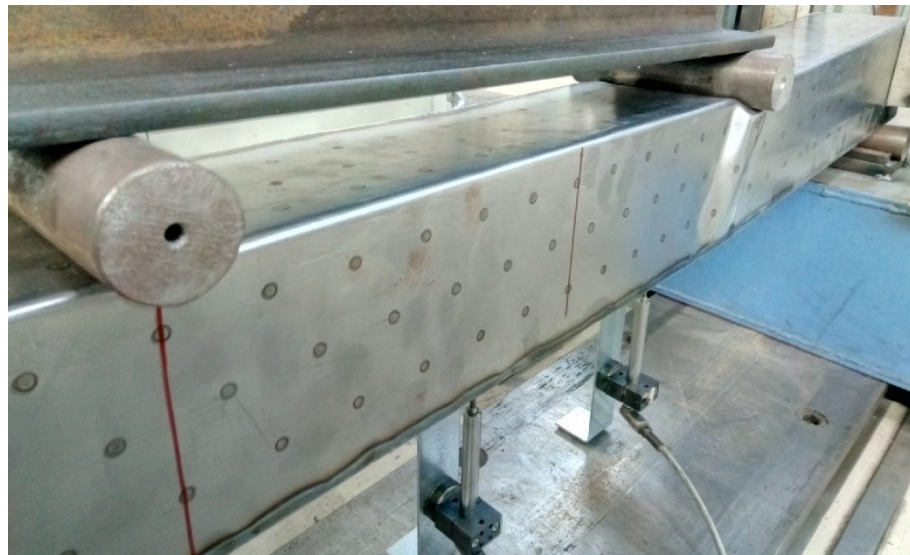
Beam 5 side view (flat 0.75 mm + structured 0.5 mm)
